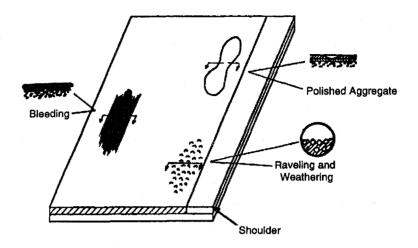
Surface defects of asphalt concrete pavement
